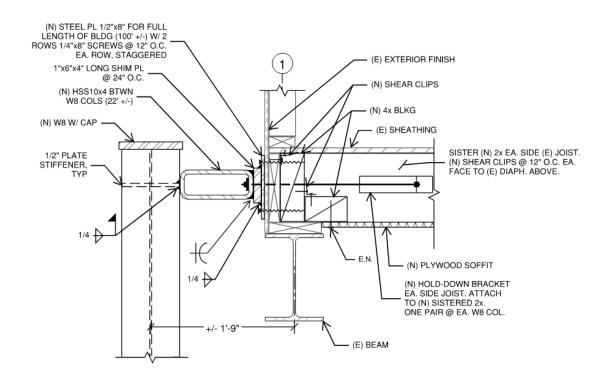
Top of steel cantilever column located outside the building footprint.
